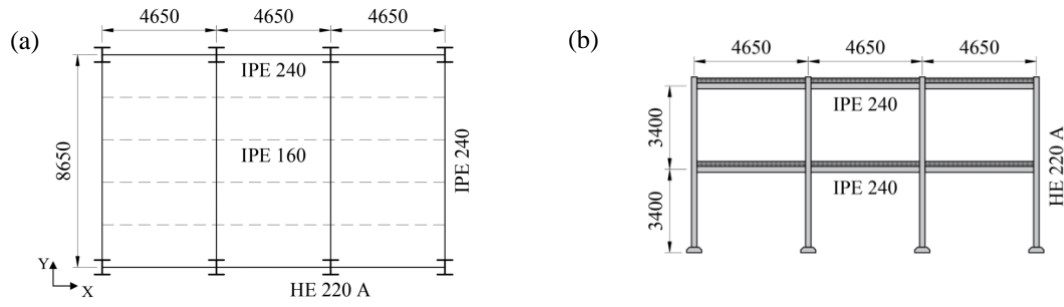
Prototype structure: (a) plan and (b) elevation views. [units in mm].
